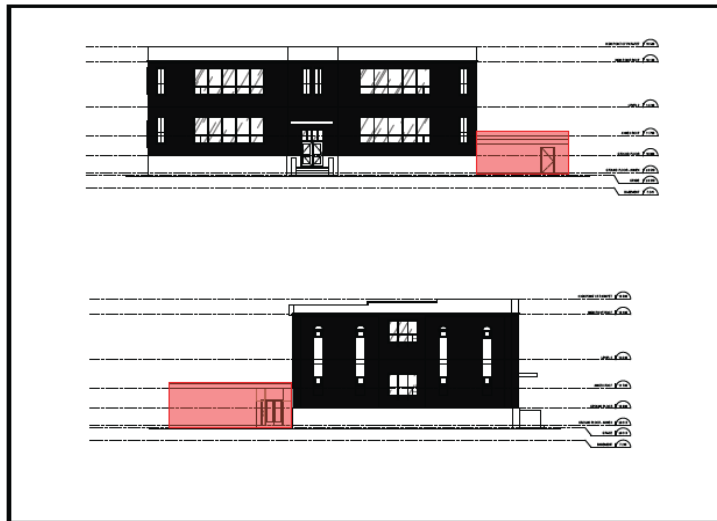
Southwest and northeast elevations of proposed demolition. EVOQ.
